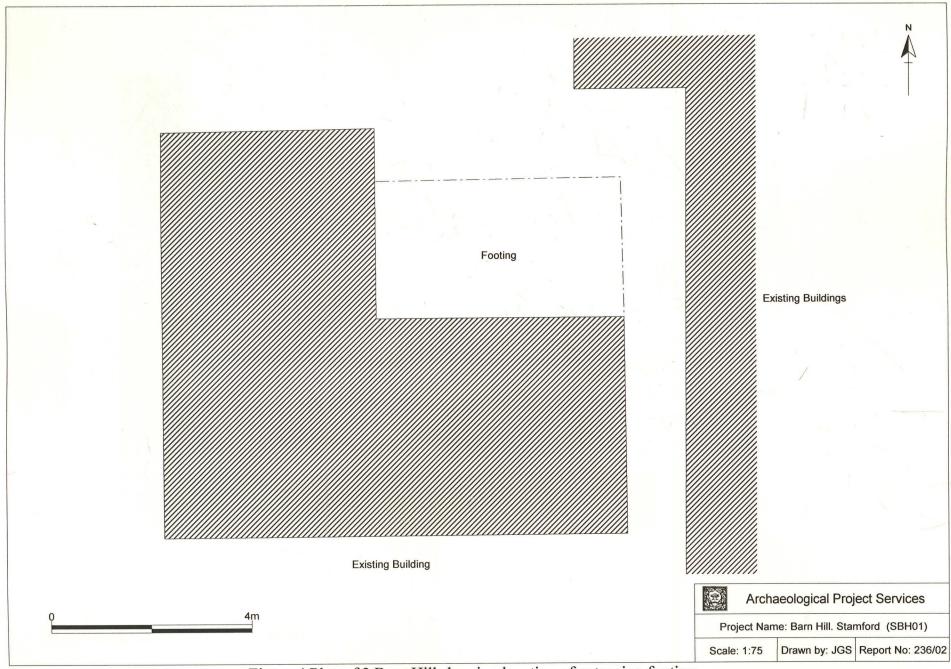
Plan of 2 Barn Hill showing location of extension footing.
